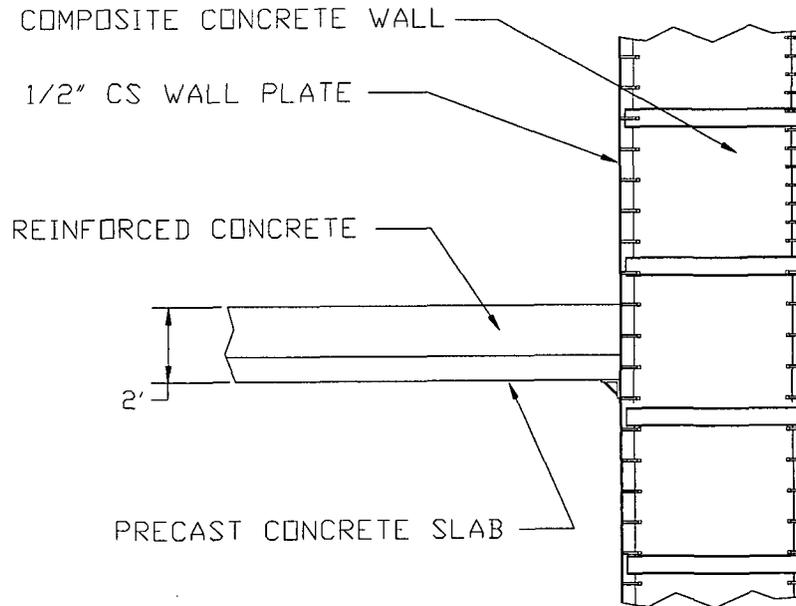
New Fuel Pit Floor and Wall Detail
